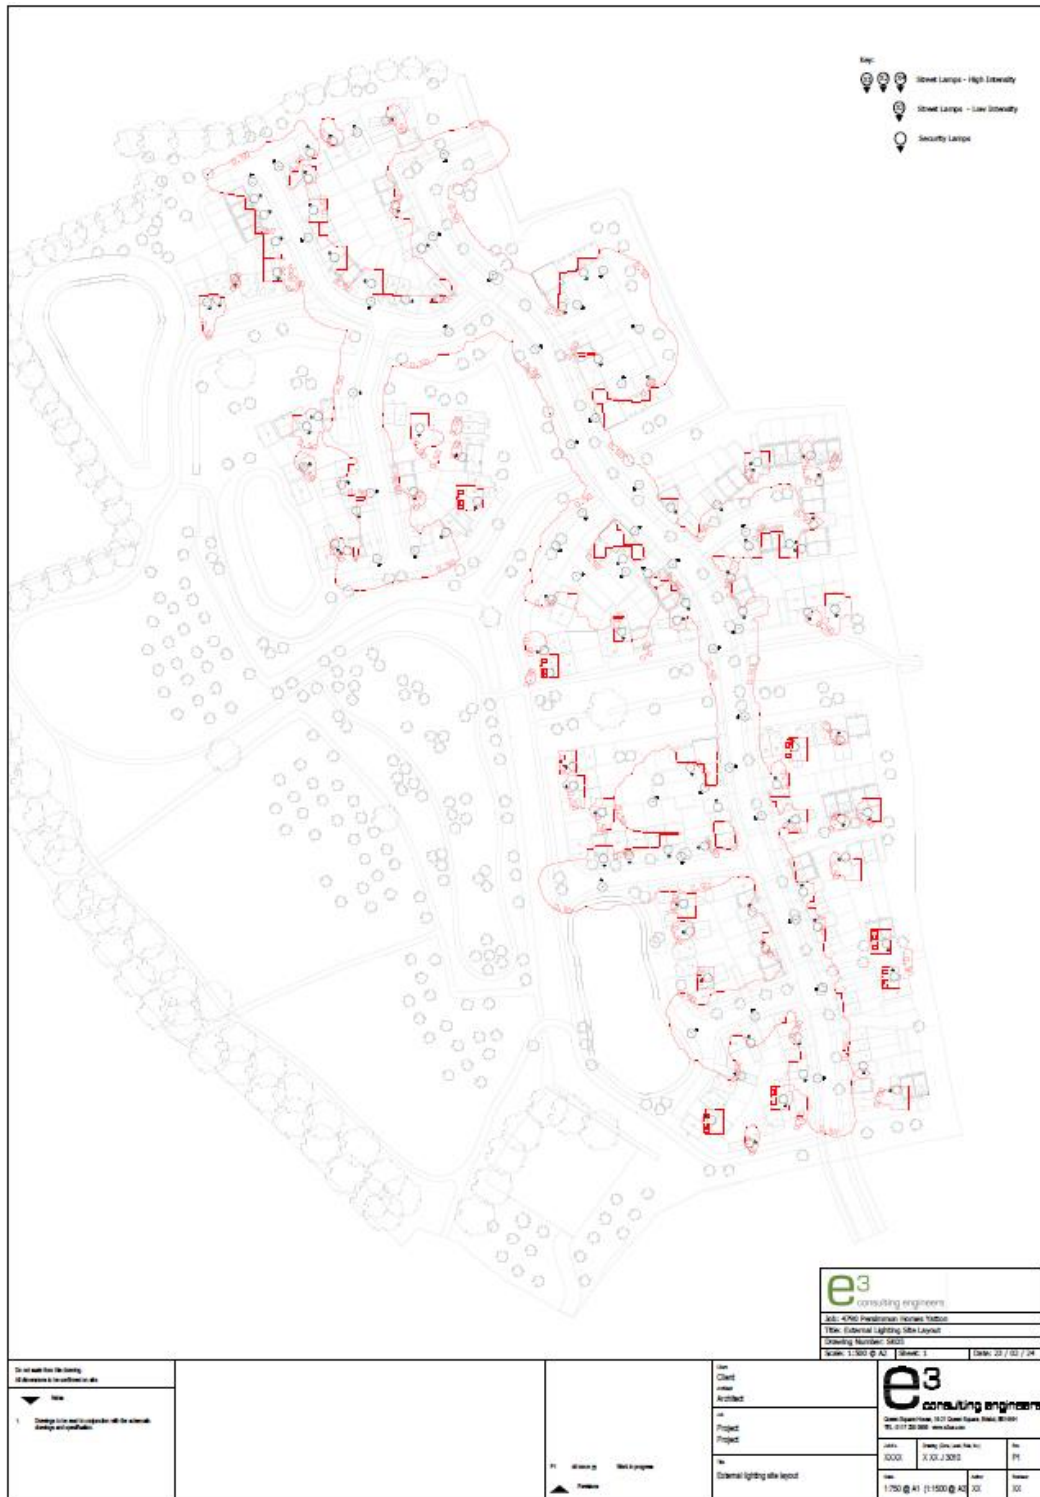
External Lighting (lux contour plan) based on the illustrative masterplan.
